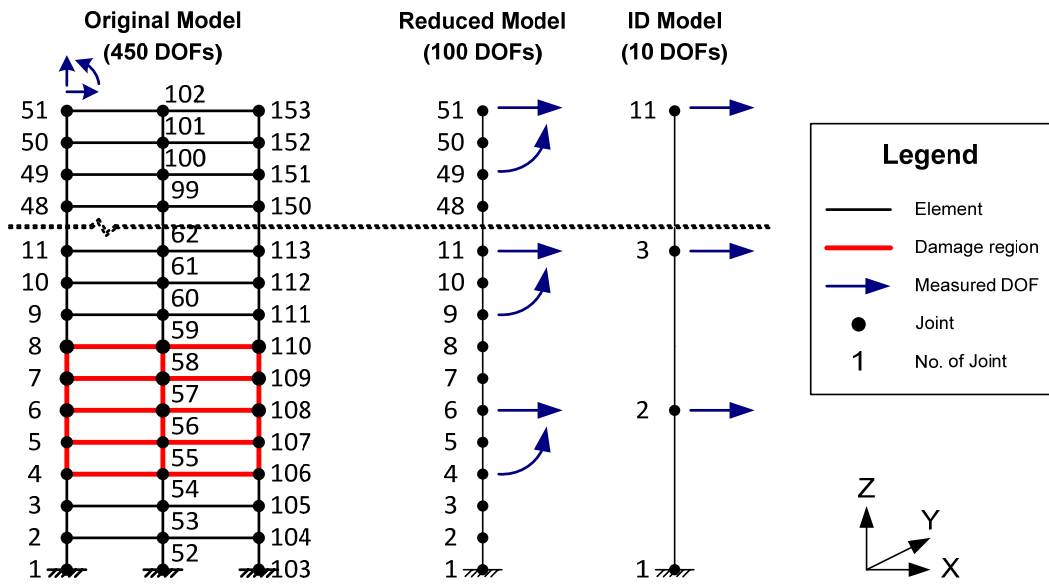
A 2-span 50-story reinforced concrete 2D flexible building.
